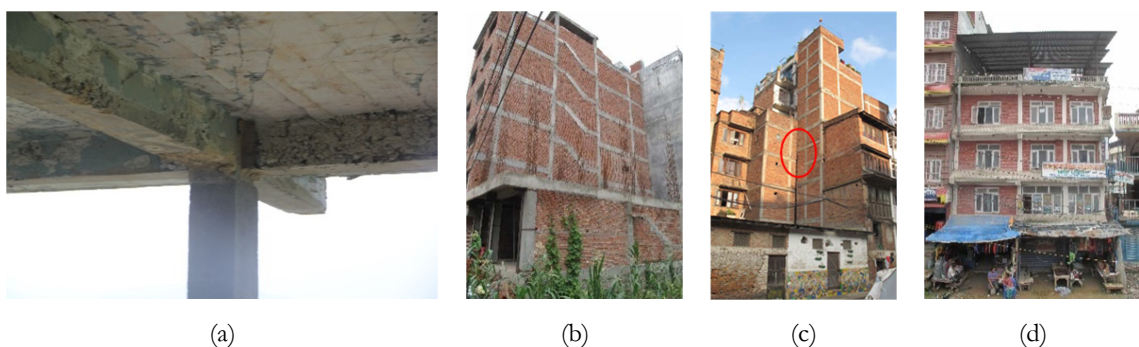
Examples of common RC construction and recorded structural defects; (a) Poor material quality, compaction, and insufficient effective cover in beam and column, (b) Irregular distribution of infill walls and discontinuity of floor beams, (c) Slenderness and vertical irregularity and no seismic gap and (d) Soft-storey at the ground floor
